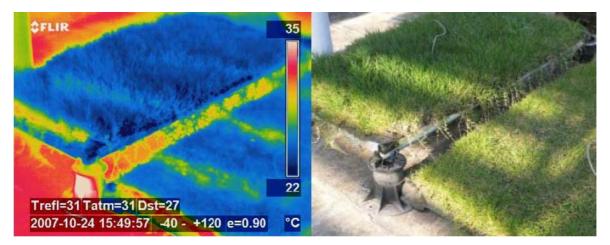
Infrared photo of aluminium panels used for modular green roofs; one with raised floor (left) and one placed directly on rooftop (right)
